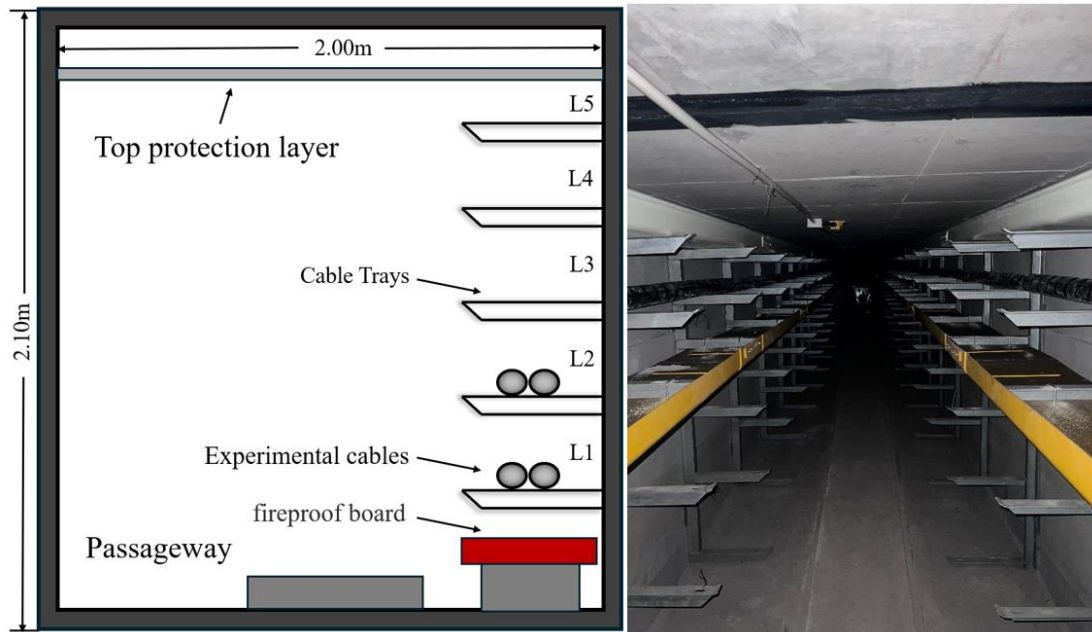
Schematic cross-section of cable tunnel (unit: m)
